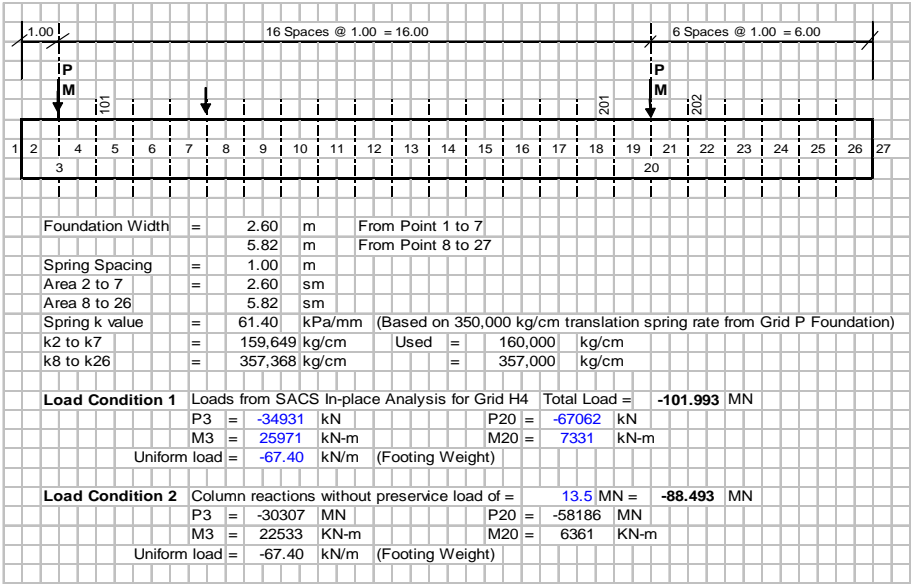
Footing SACS model for DPP North (Opposite Launch Face)
